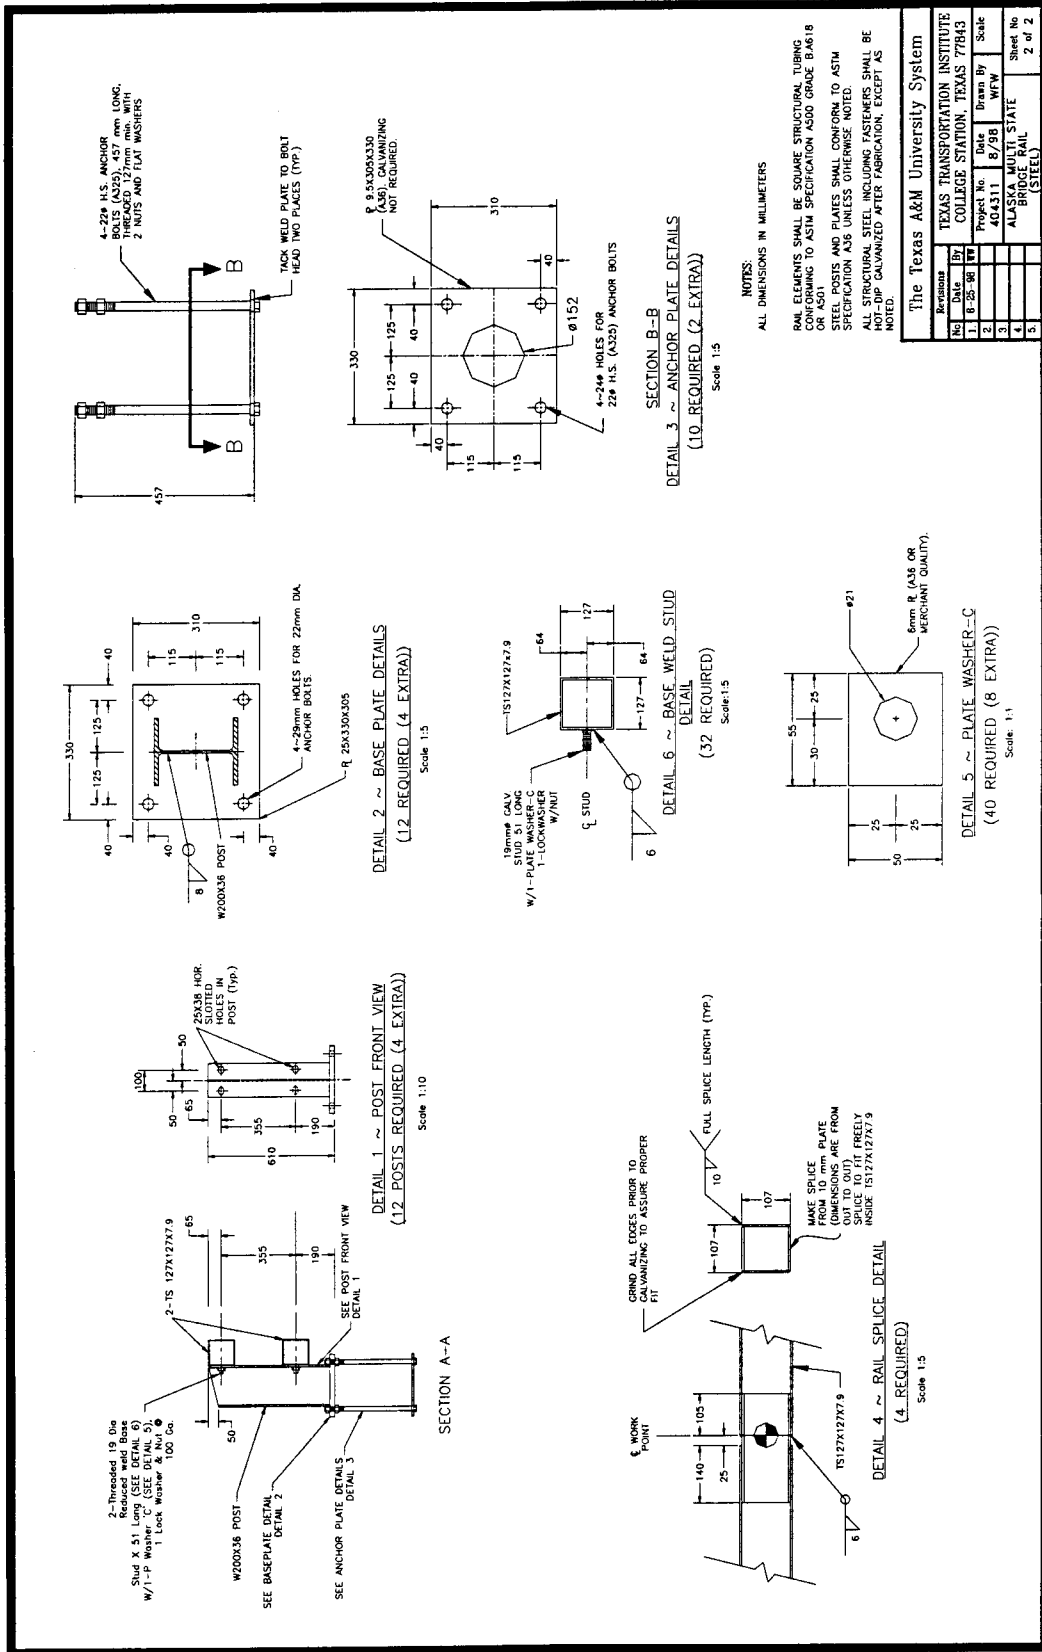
Details of the Alaska Multi-State Bridge Railing mounted on the curb (steel) (continued).
